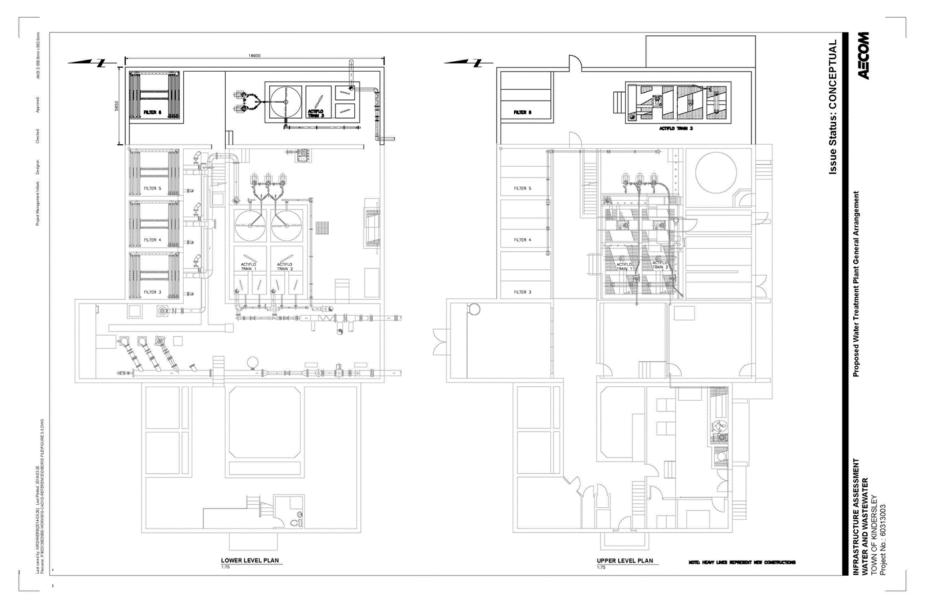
Proposed Water Treatment Plant General Arrangement
